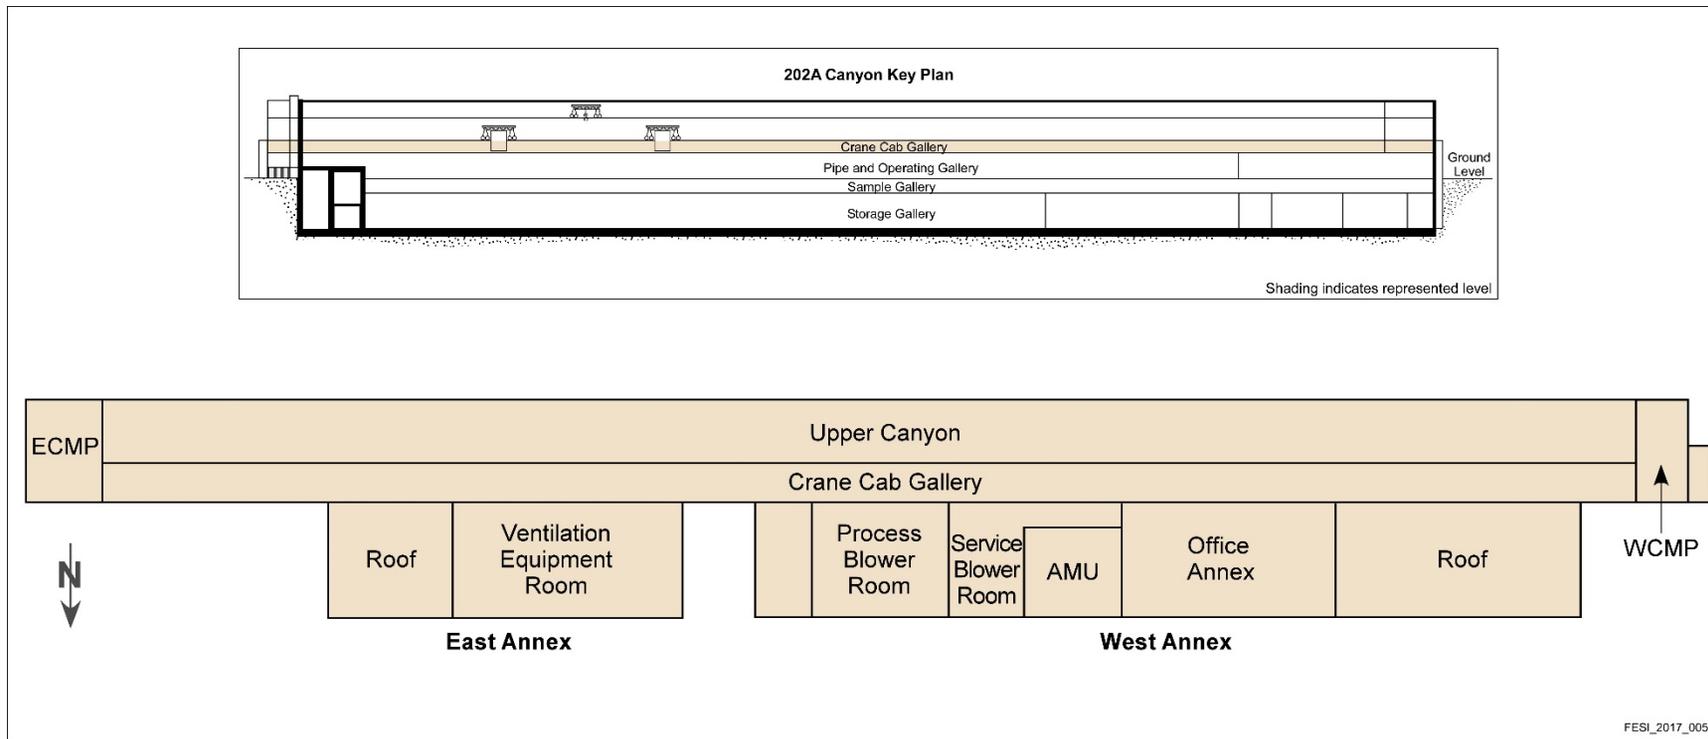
202A Building Crane Cab Gallery Level Plan View
